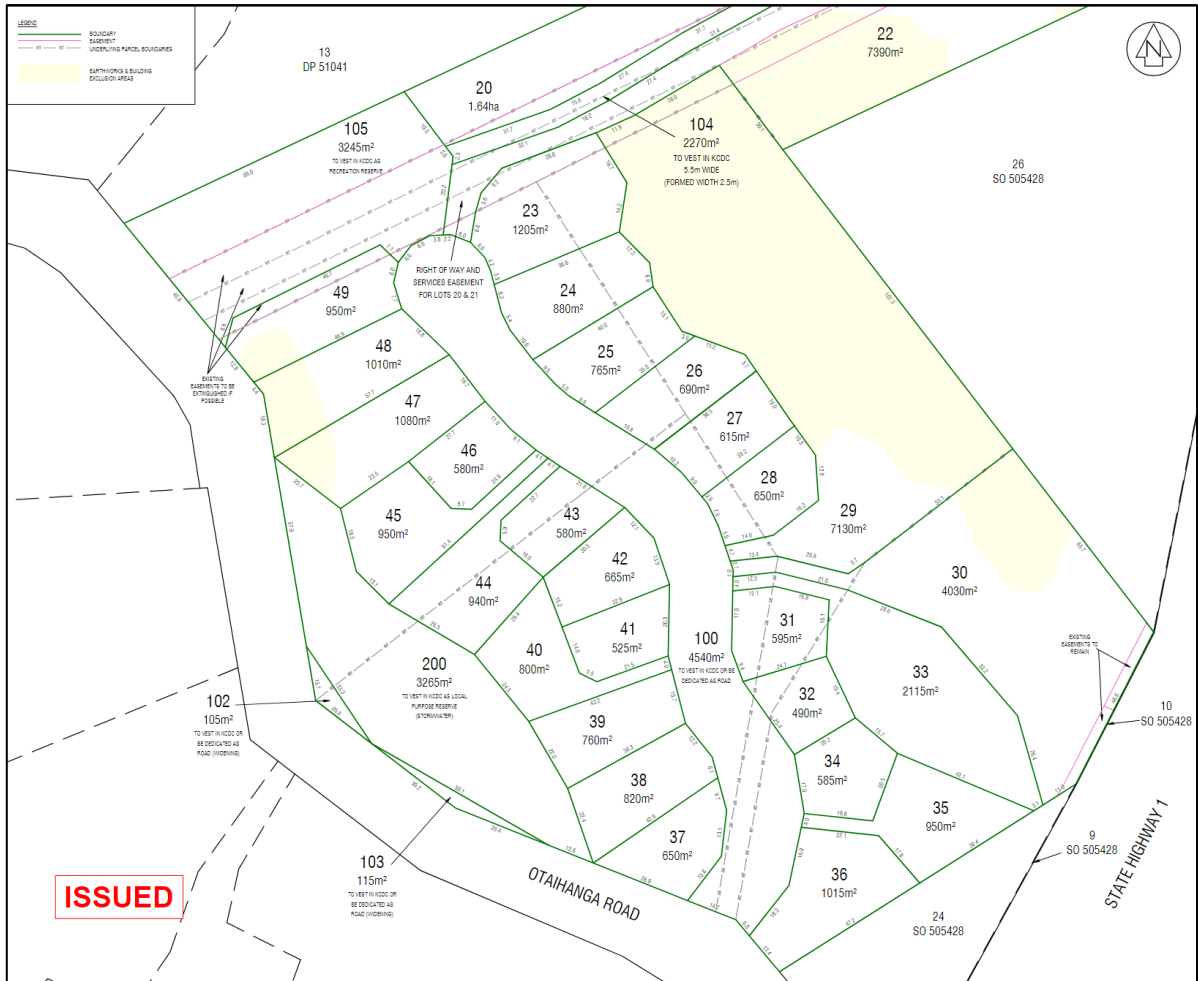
Proposed scheme plan showing the lots accessing from Otaihanga Road
